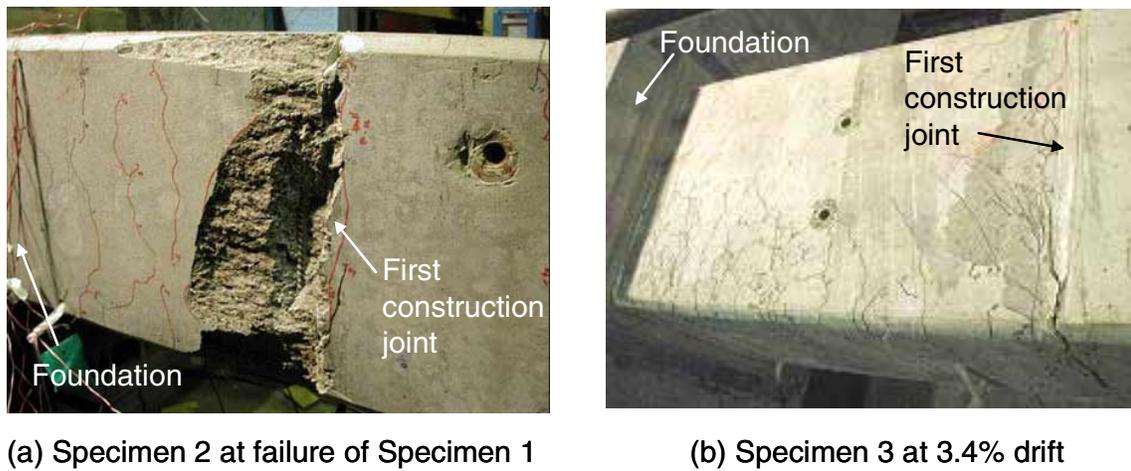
Damage near peak drifts for piers with (a) concrete and (b) HPFRCC segments.
